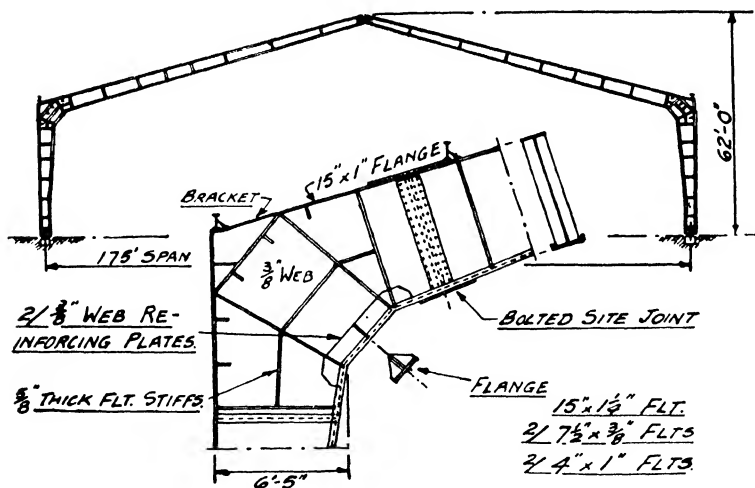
THREE-HINGE PORTAL FRAME OF WIDE SPAN WITH FRAMES BUILT FROM PLATES
